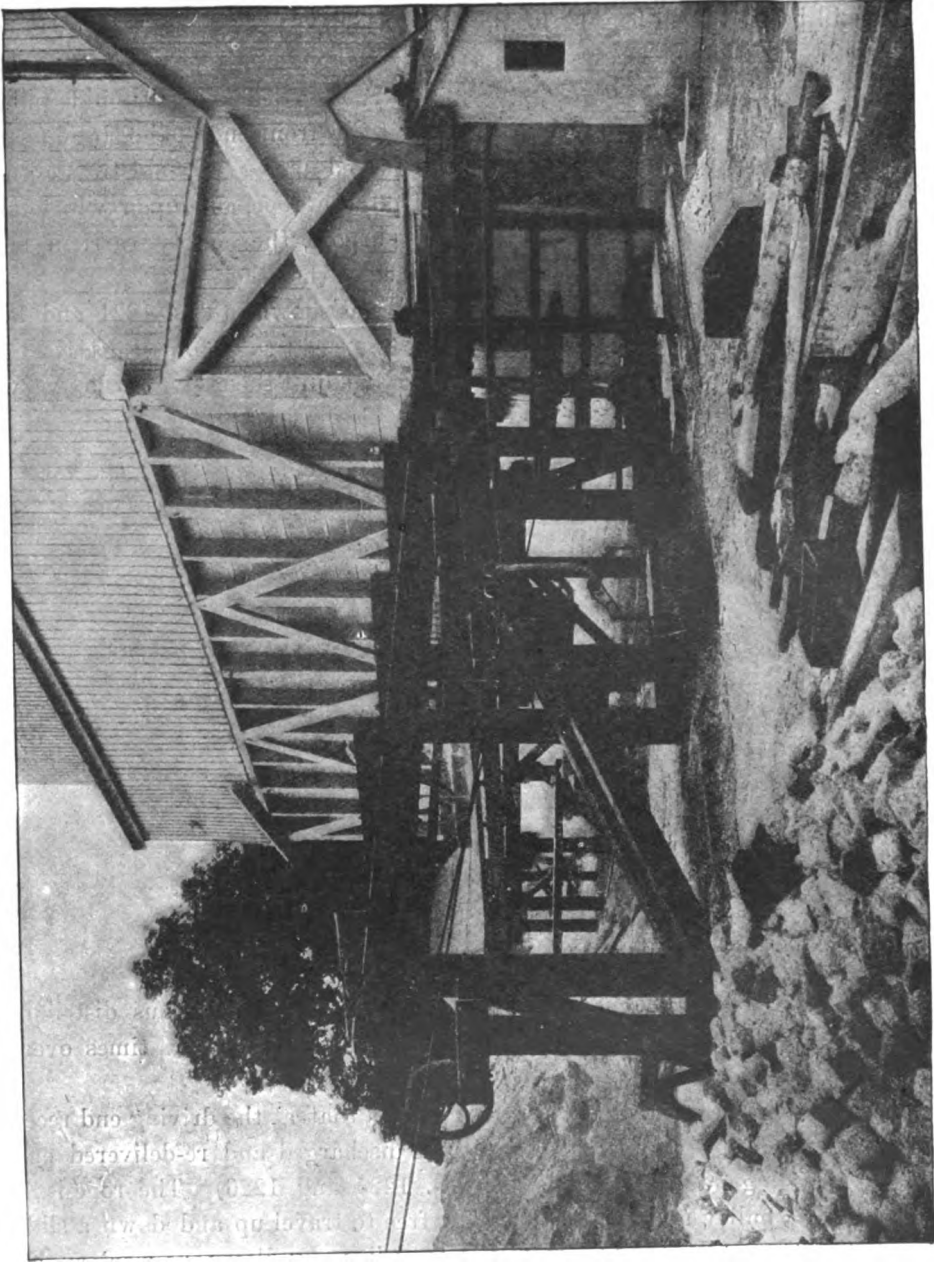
ROPEWAY DRIVING AND LOADING STATION.
